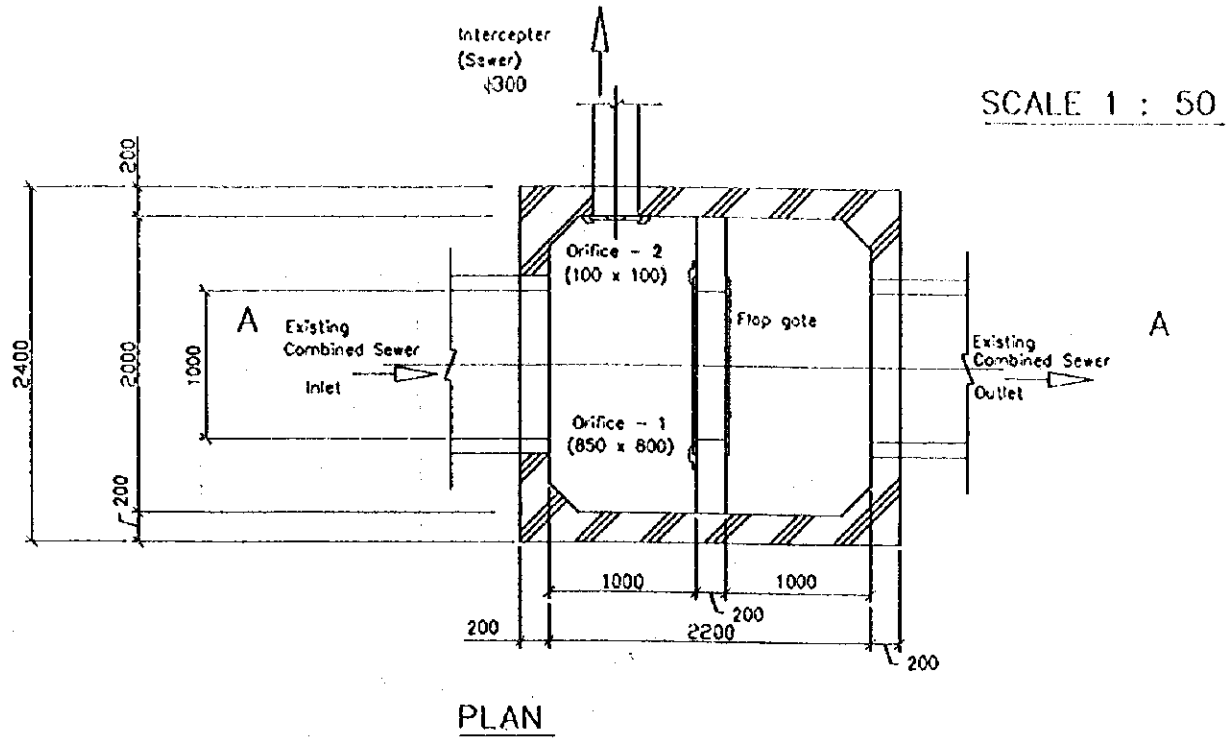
PROPOSED TYPICAL SECTION DIVERSION CHAMBER
